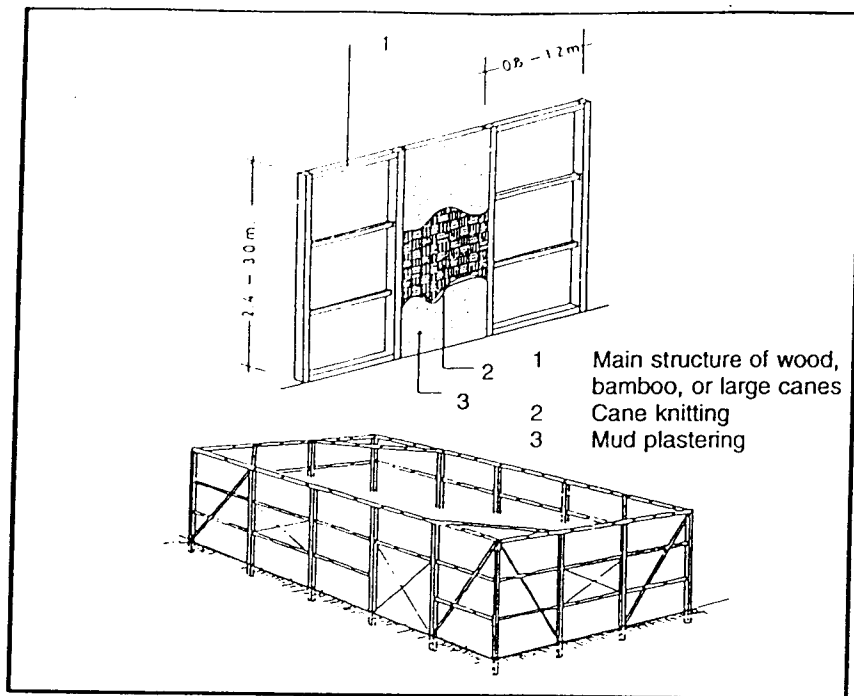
Strengthening of framework wall structures (wood, cane and earth infill) [13]
